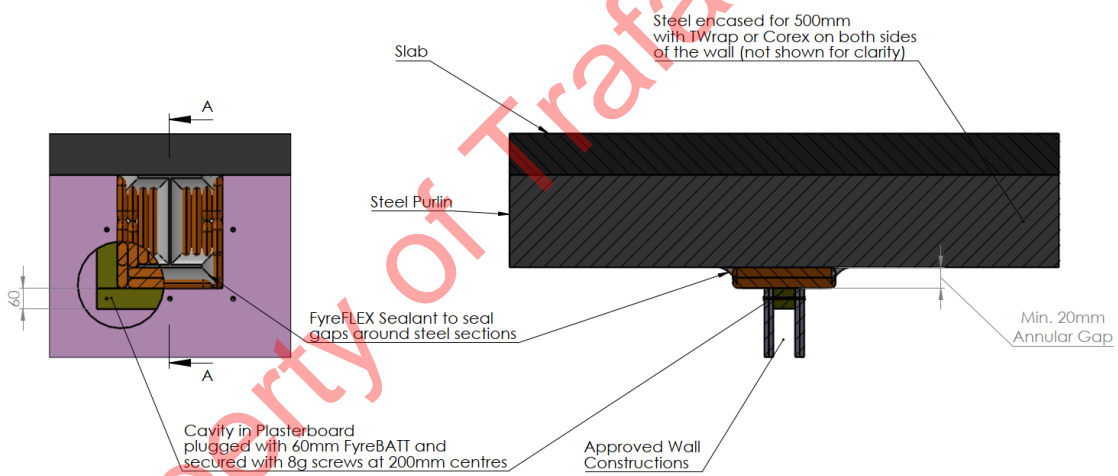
Proposed steel beam/purlin penetration system – detail 5
